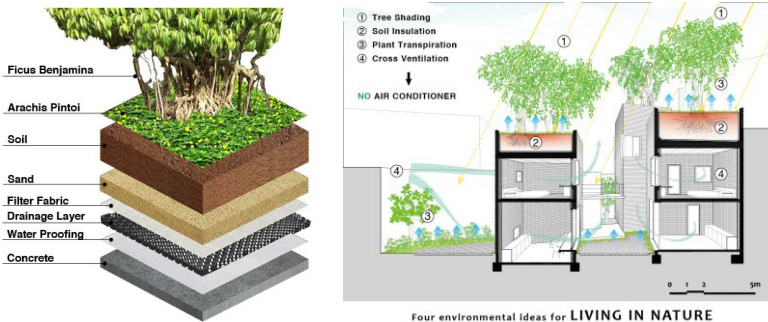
A typical cross section required for plantation on roof tops. (Sawa)
